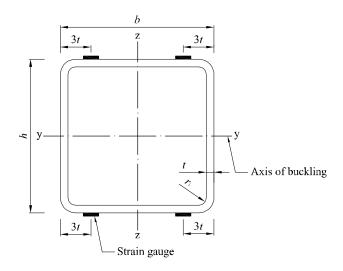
Geometry of tested cross-sections and locations of strain gauges
